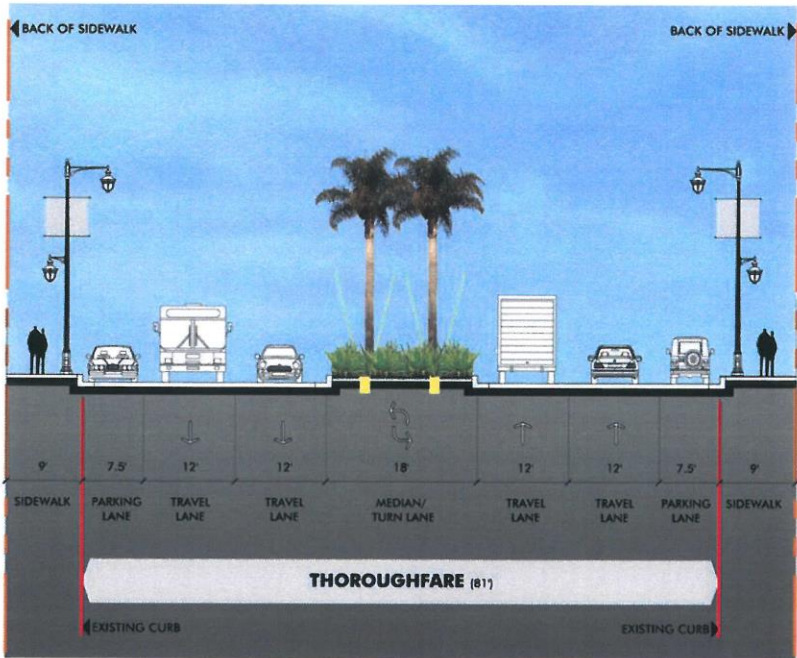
TYPICAL GATEWAY BOULEVARD CONFIGURATION
